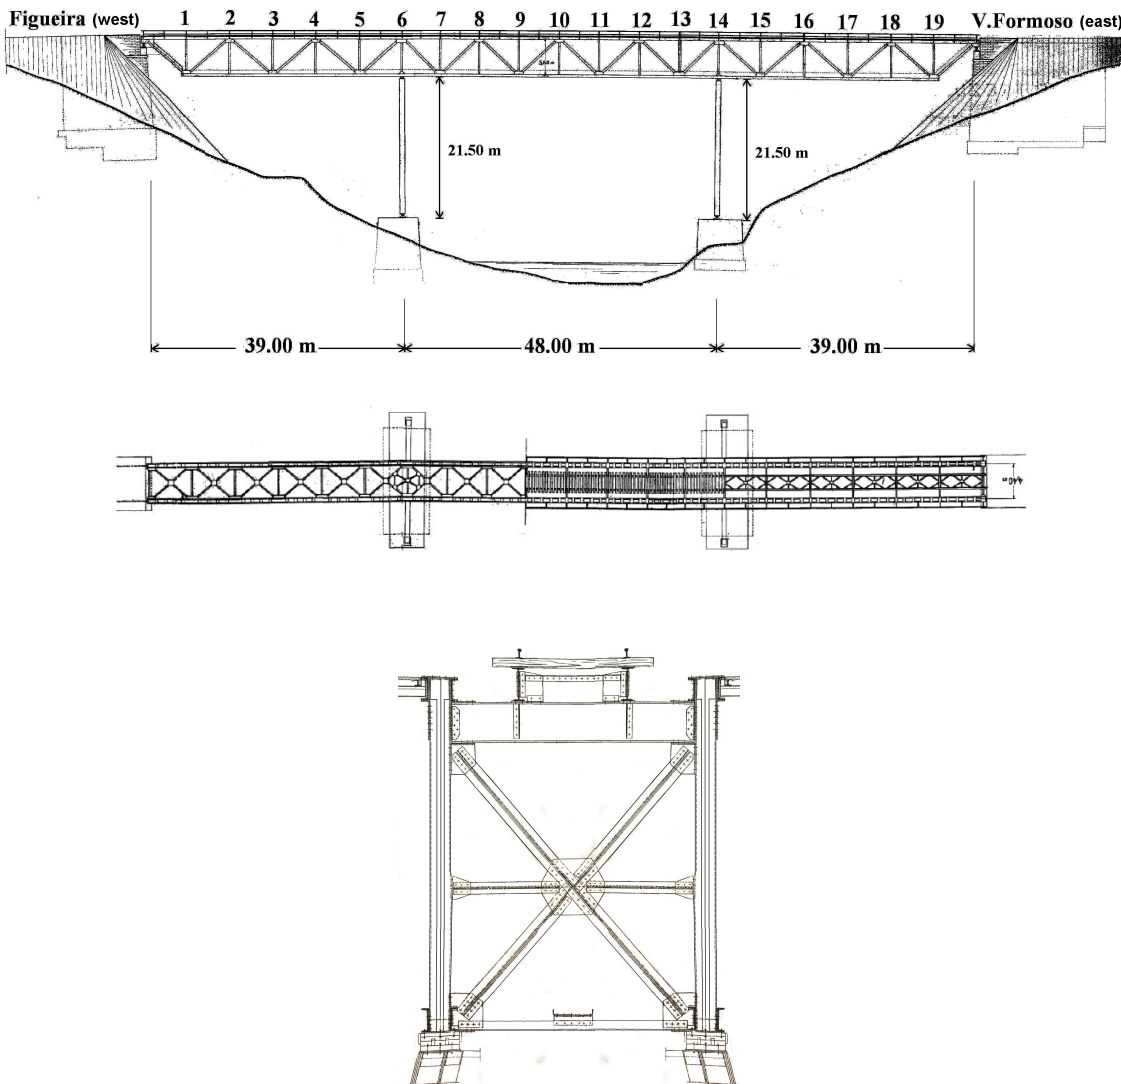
Elevation, plan view and cross section of the Trezói bridge.
